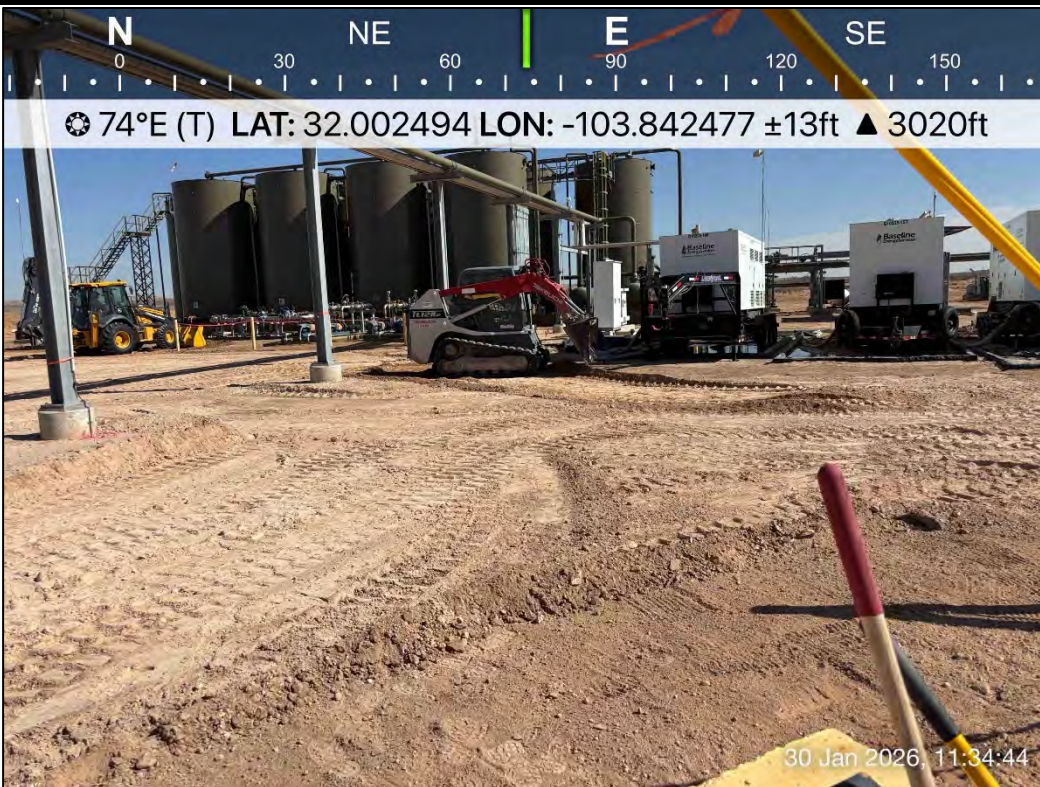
Northeastern view during excavation activities. 1/30/2026
